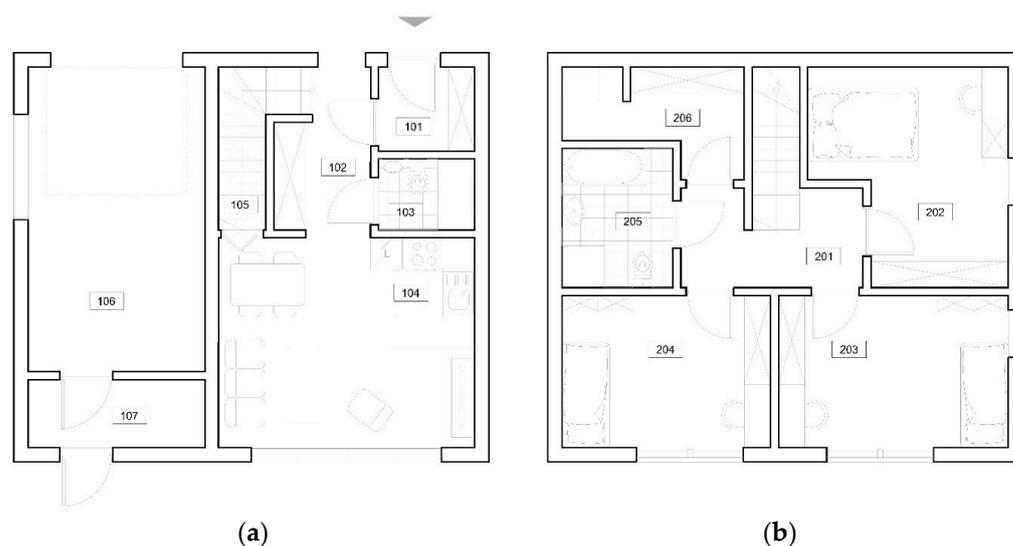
(a) Ground floor plan, description of rooms: 101—entrance lobby (entry), 102—hall, 103—bathroom, 104—living room with kitchen, 105—utility room, 106—garage, 107—technical room. (b) Attic floor plan, description of the rooms: 201—landing, 202—bedroom I, 203—bedroom II, 204—bedroom III, 205—bathroom, 206—utility room.
